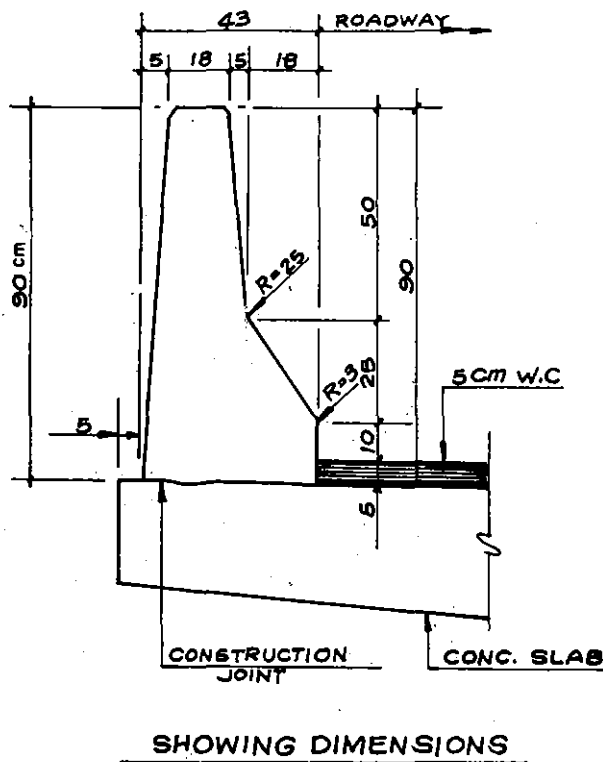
Vehicle-Parapet for bridge without sidewalk
